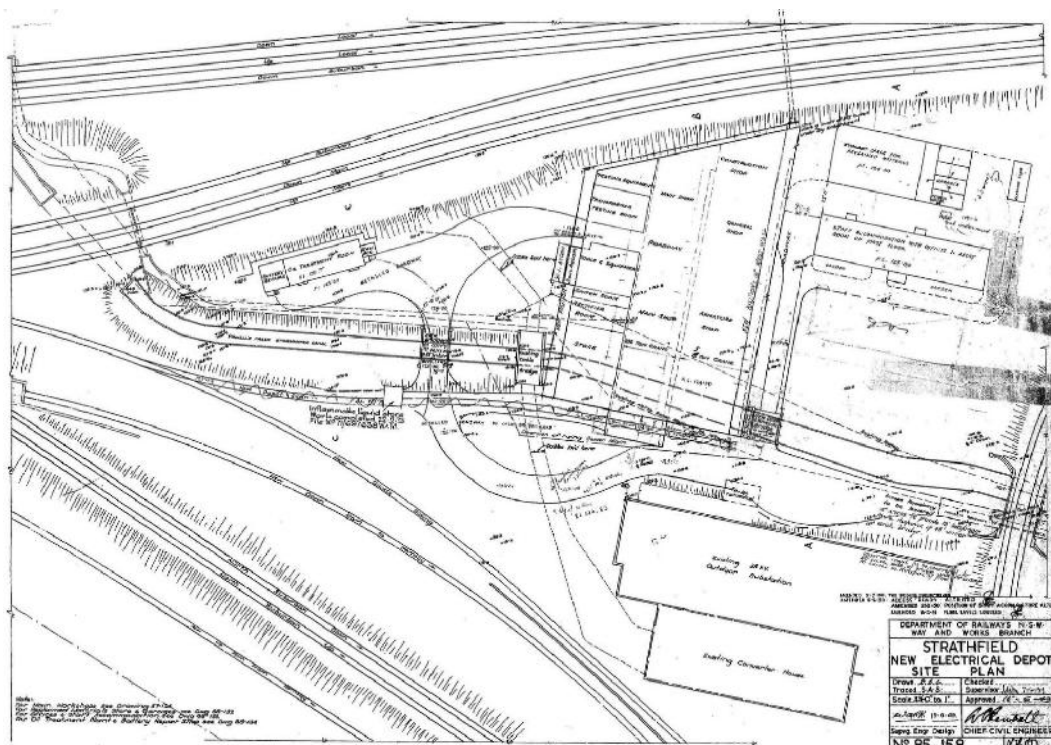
Plans for a new railways electrical maintenance depot in the Strathfield Triangle, 1949-1950. (RailCorp Plan, Ref: 0076688).
